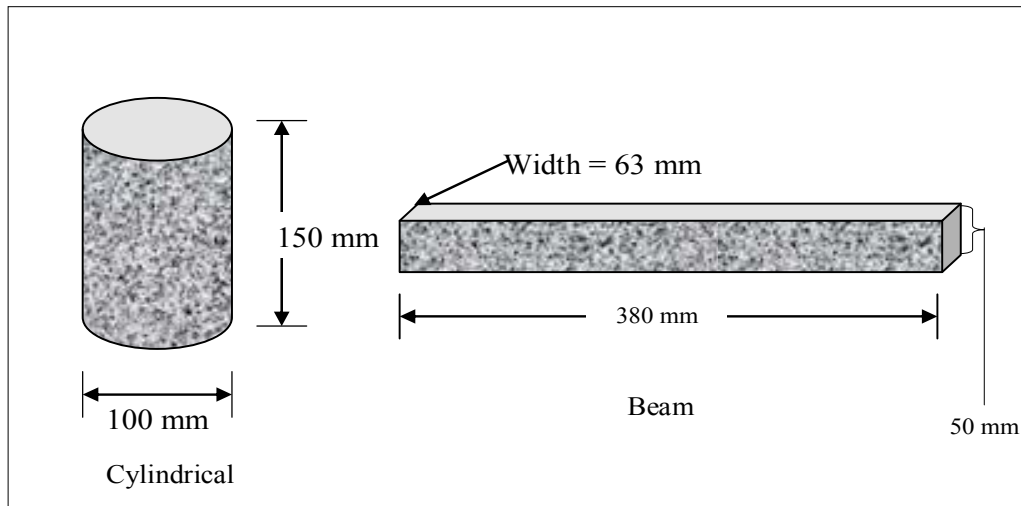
Laboratory Test Specimens (Drawing not to Scale)
